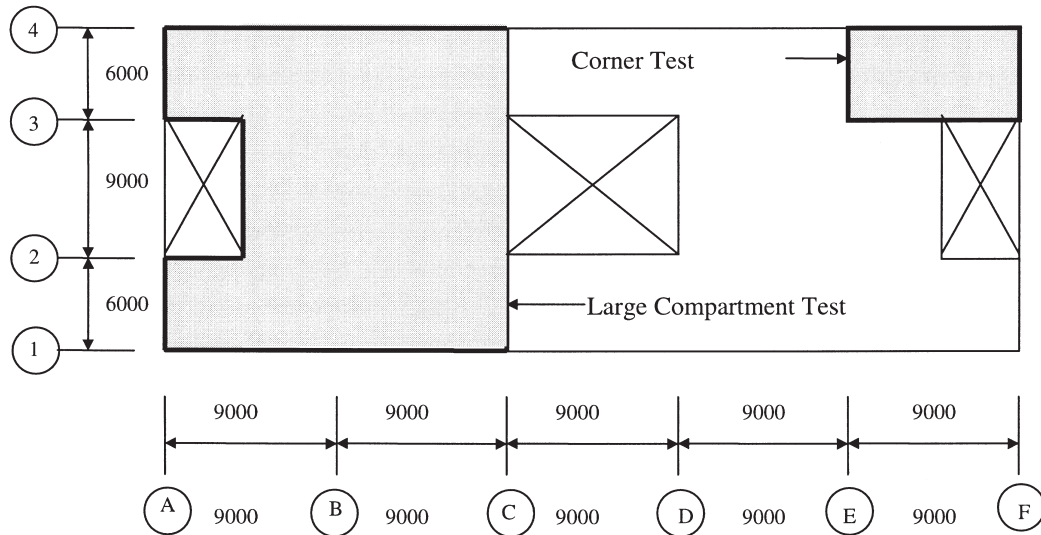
Plan locations of BRE Corner and Large compartment fire tests.
